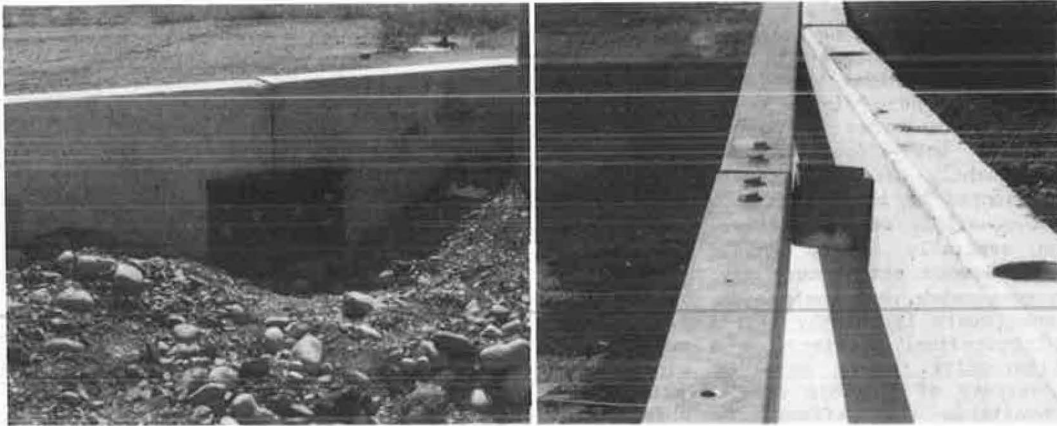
Pier-protection barrier for Tests 76 and 77: continuity connectors and earth fill (left), and a 6 by 6-in. blockout at Section B (right).
